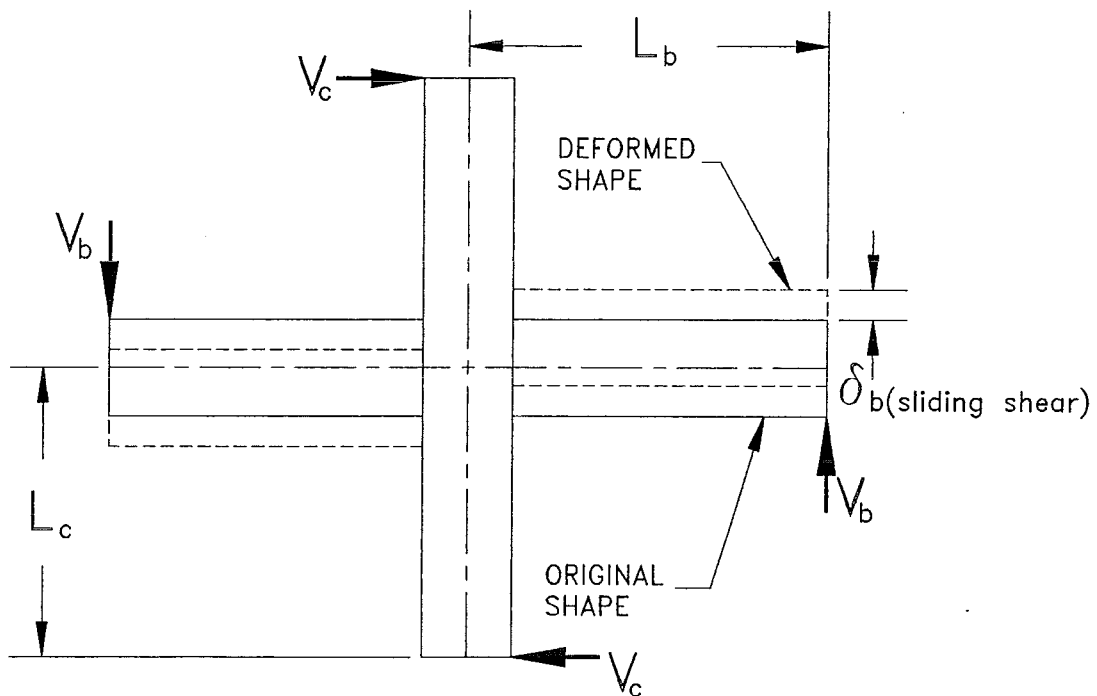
Deformations due to sliding shear of the beams at the beam-column face
